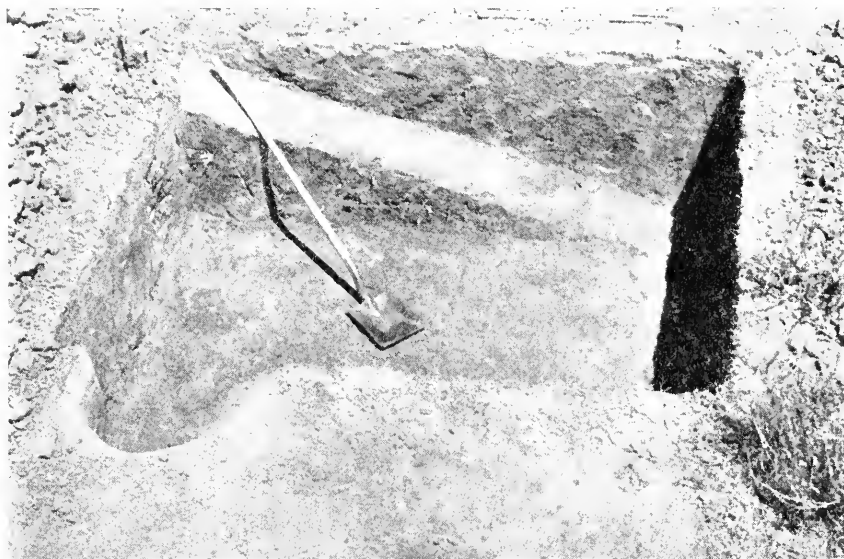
Excavation for Gavilan installation (southern California quail refuge). Note outside form of settling basin in lower left and of trough at the upper edge of picture.
